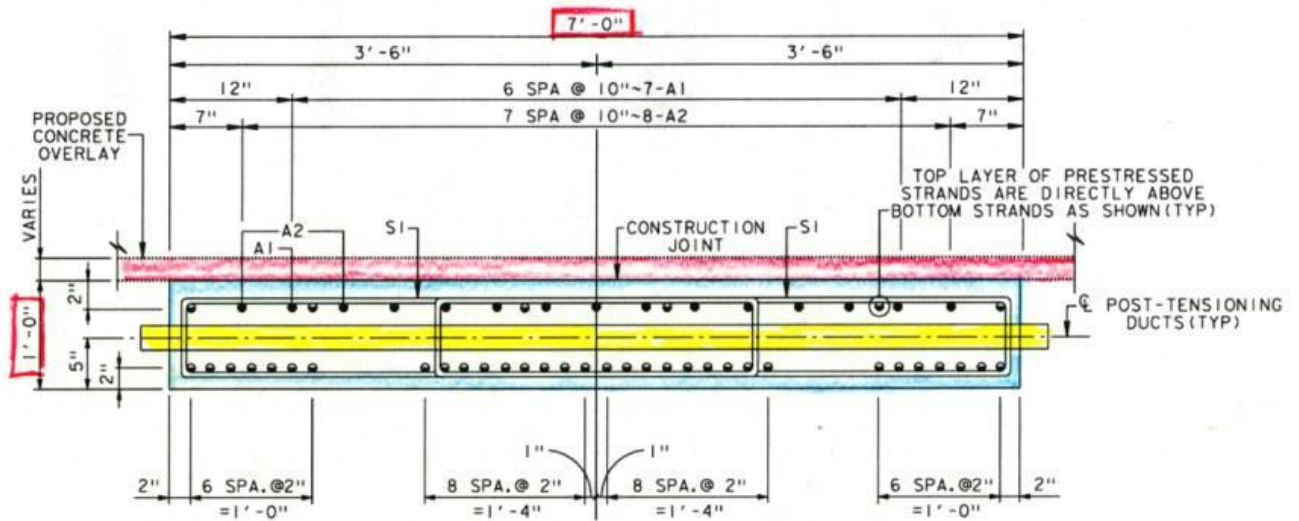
Cross section of the precast deck of the arch tied bridge
